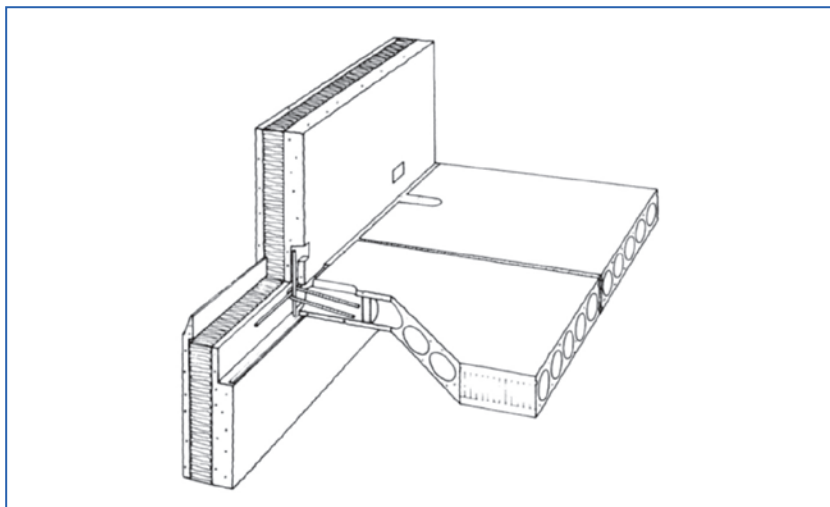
Example of prefabricated hollow core concrete slab and a concrete sandwich façade element.
